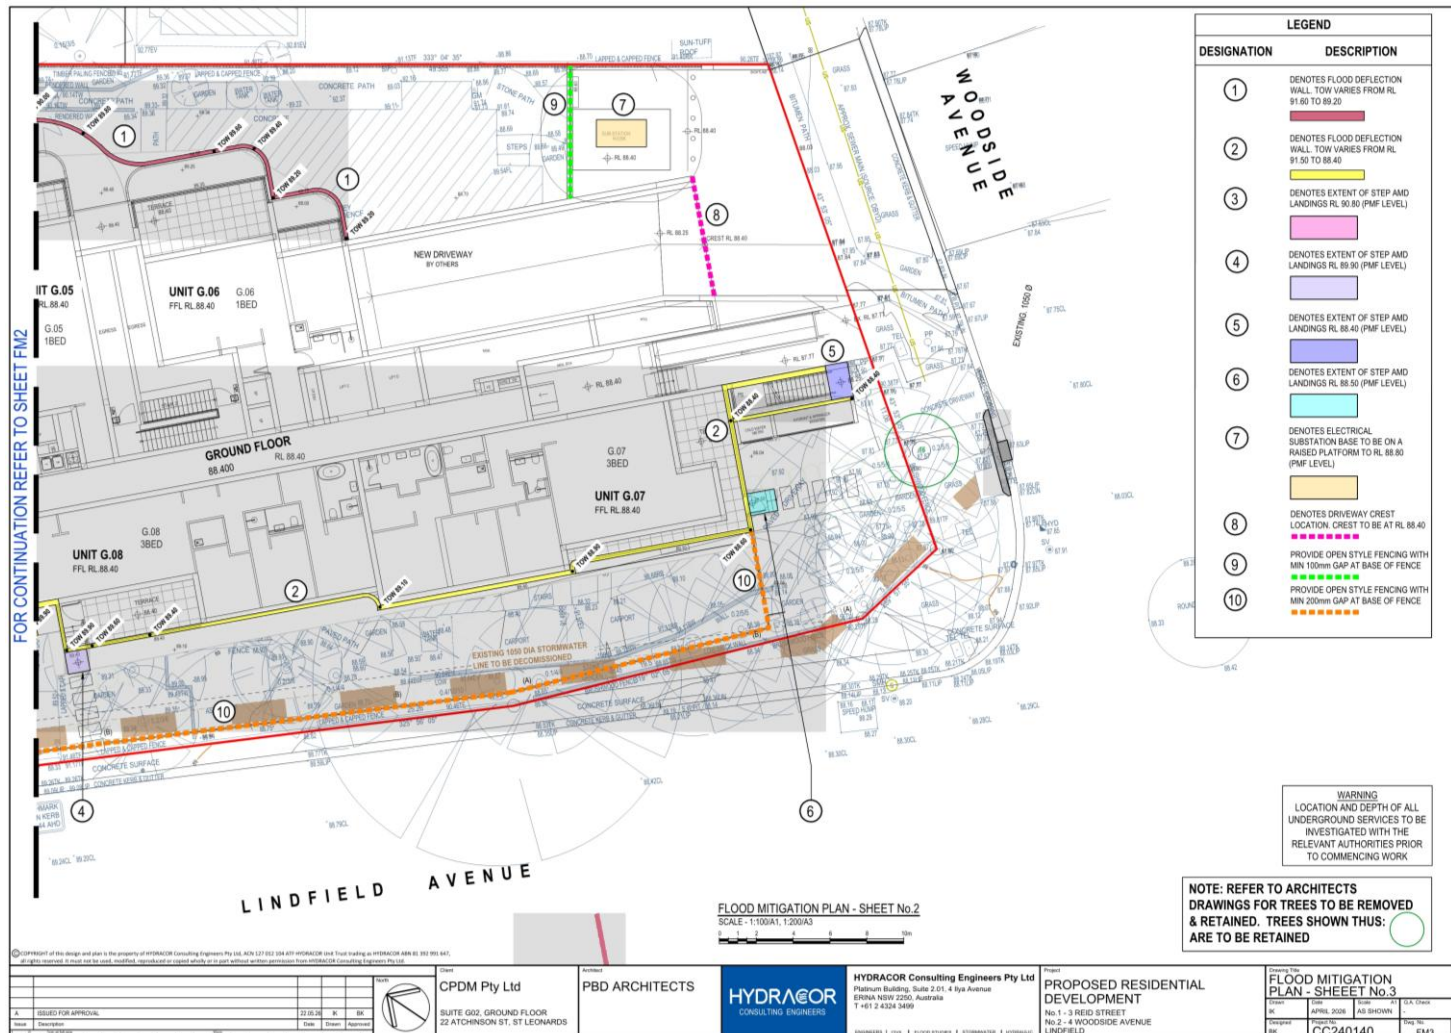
Flood Mitigation Plan – Sheet No. 3 (HYDRACOR, Issue A)
